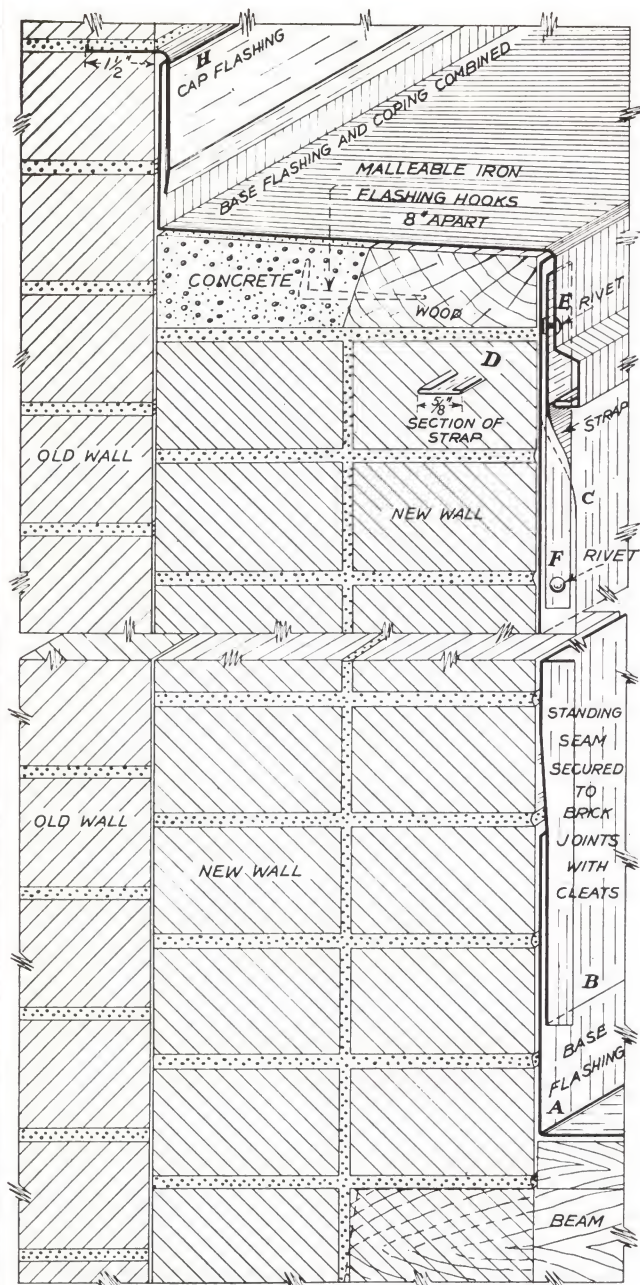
SHEET METAL COPING ON NEW WALL BELOW
